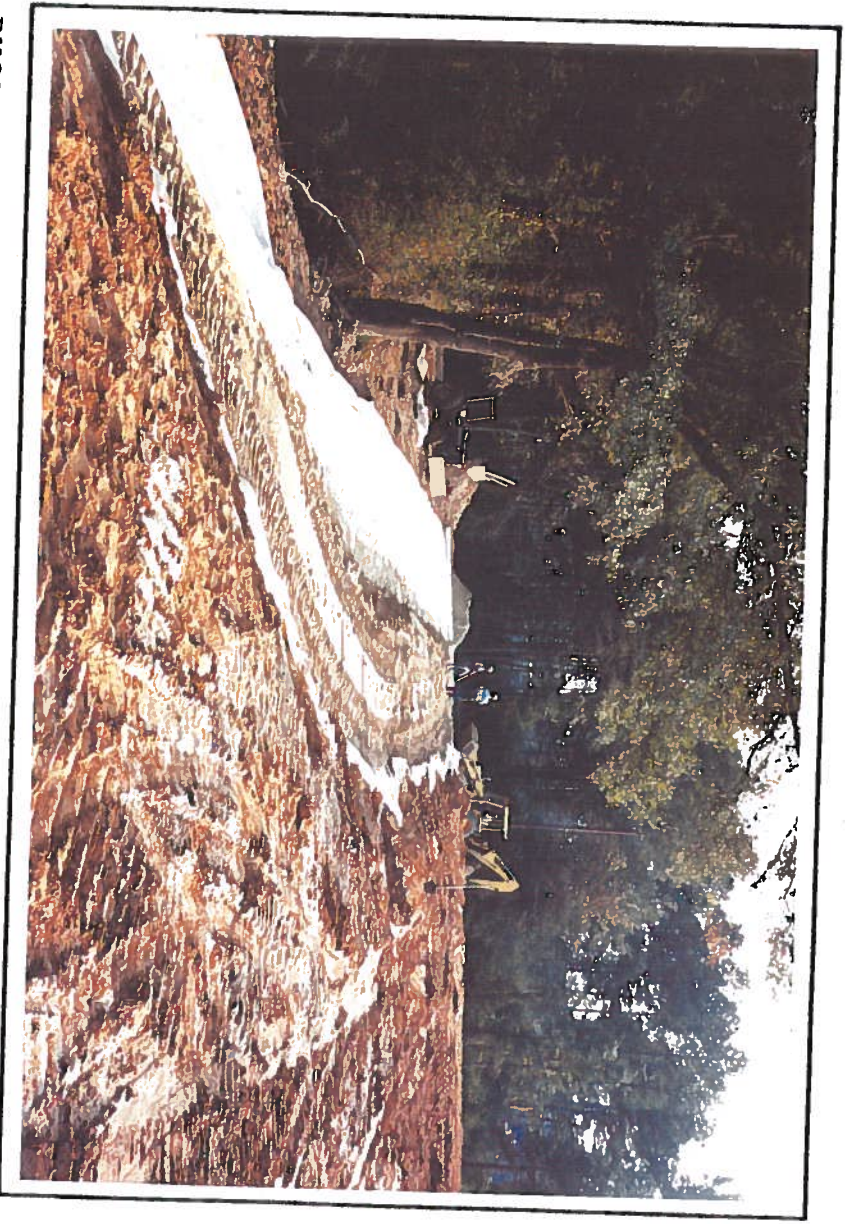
Folding Filter Fabric back over the Ten-Foot Extension
